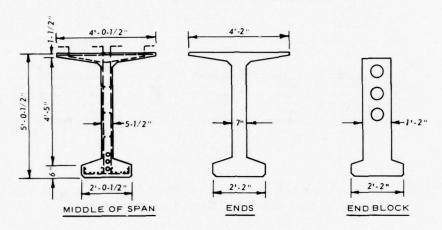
Section of prestressed concrete bulb-T girder (from Reference 18)
